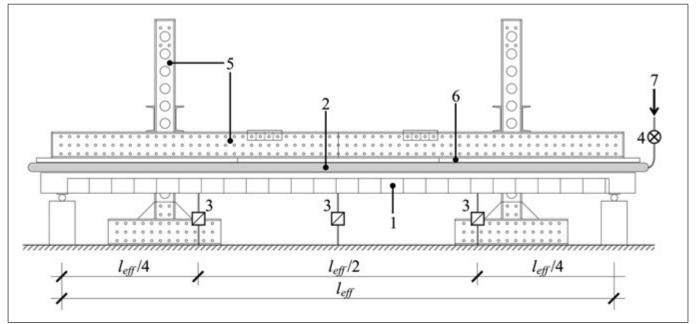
Front view of the test arrangement (1 – Porotherm floor specimen; 2 – pressure blanket for the loading of the specimen; 3 – inductive displacement pick-up; 4 – pressure gauge; 5 – loading frame; 6 – counter formwork; 7 – compressed air supply)
